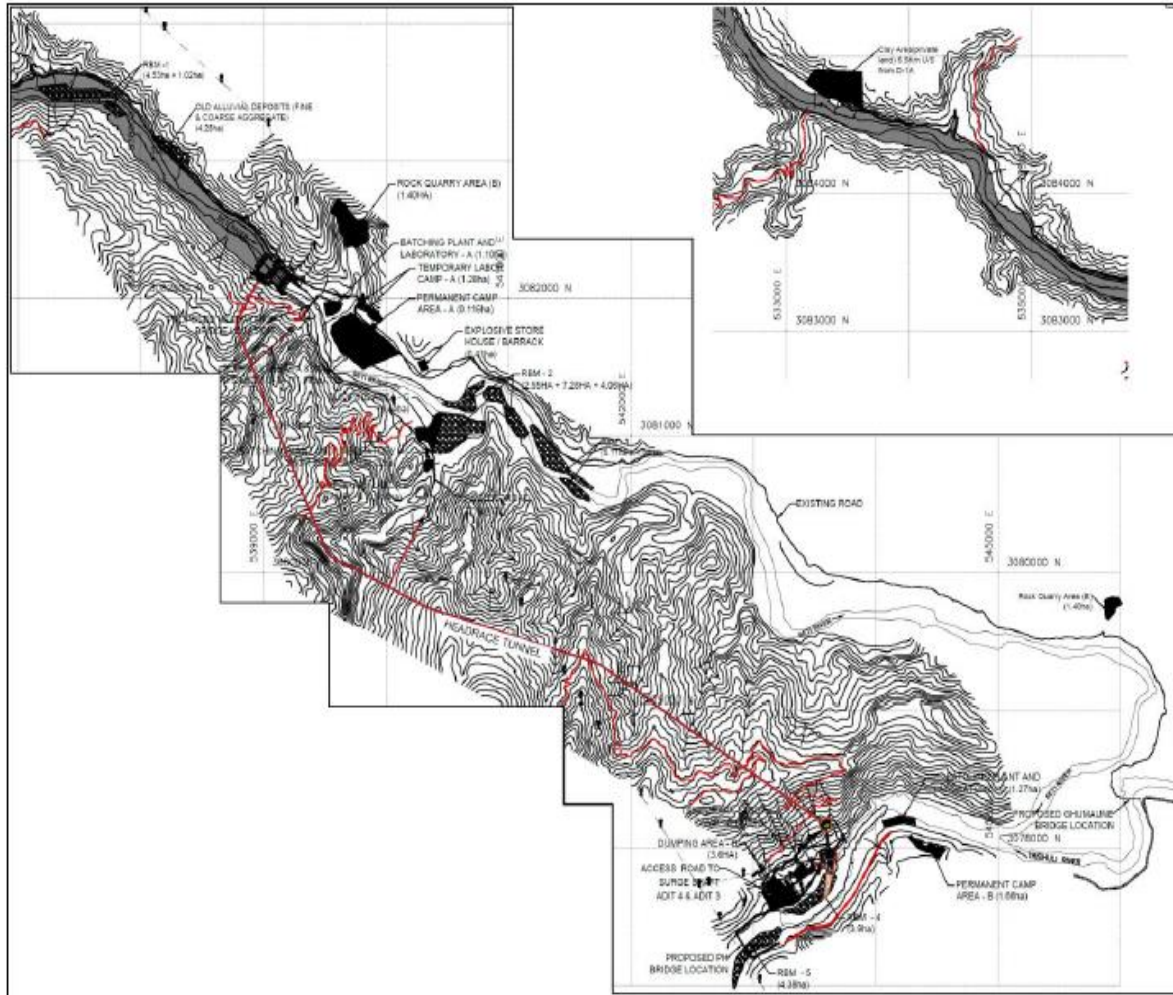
General Layout of the Project (Source: Detail Design Report, 2021)
